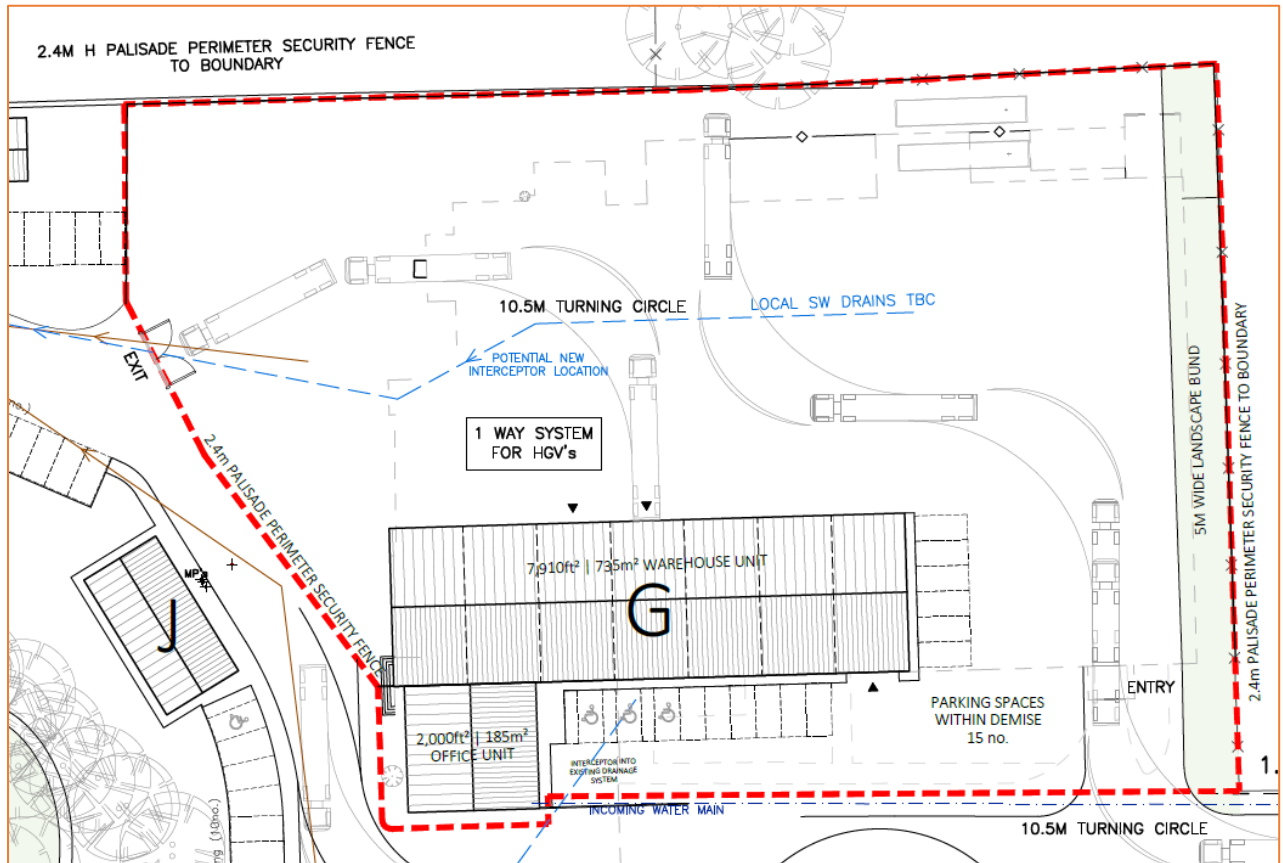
Proposed site layout plan (Source: Manning Elliot Partnership)
